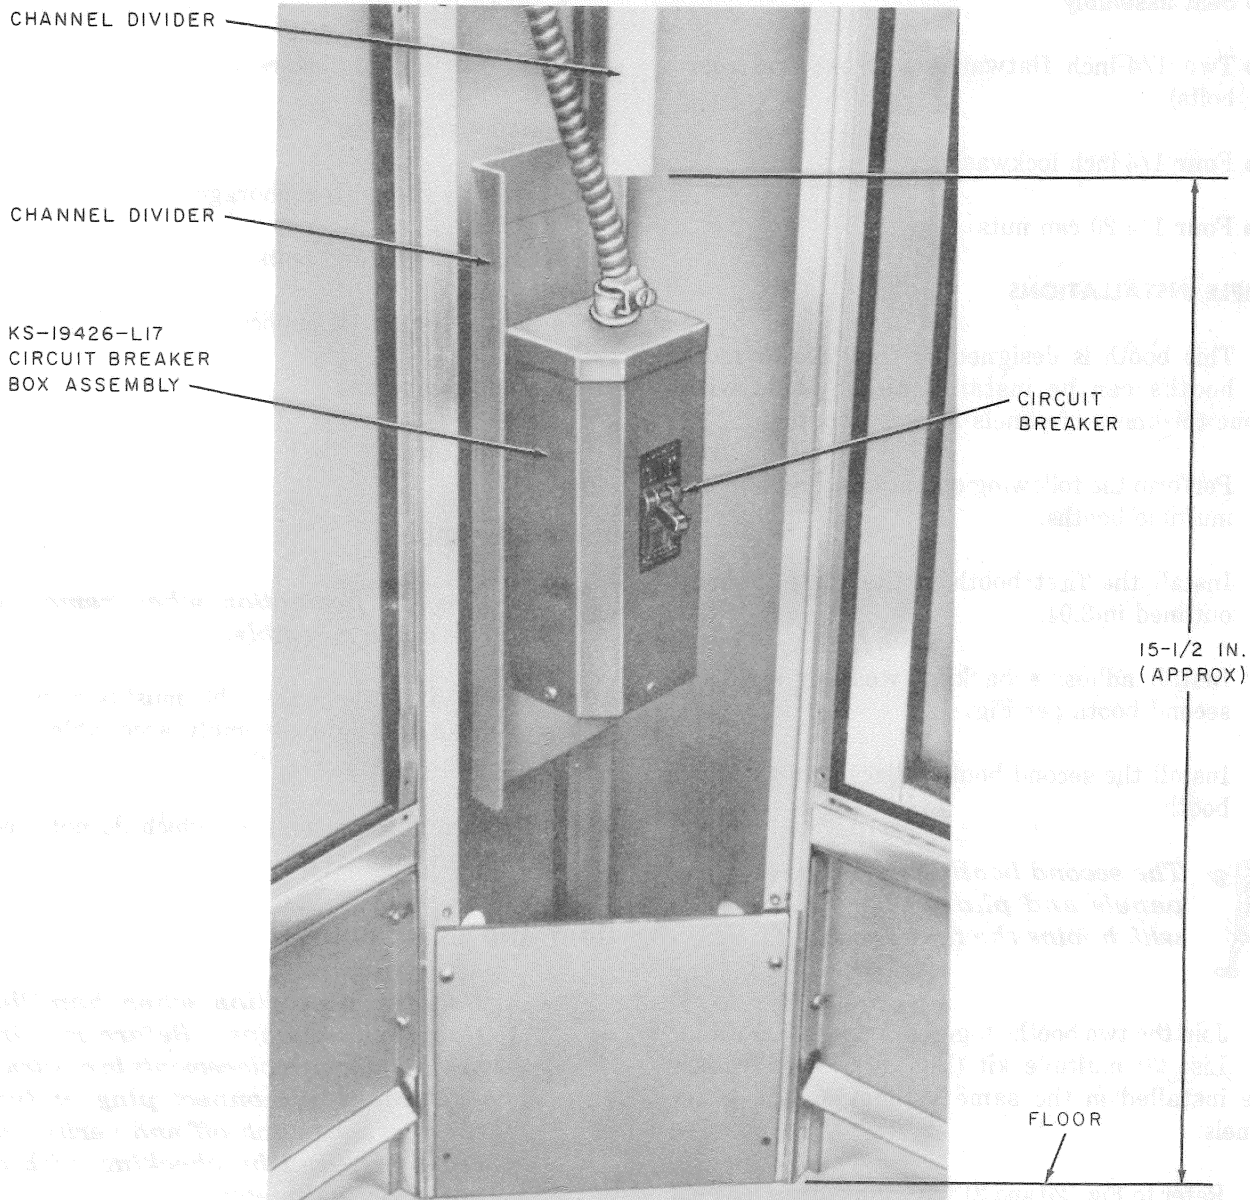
KS-19426, List 17 Circuit Breaker Box Assembly, Installed
